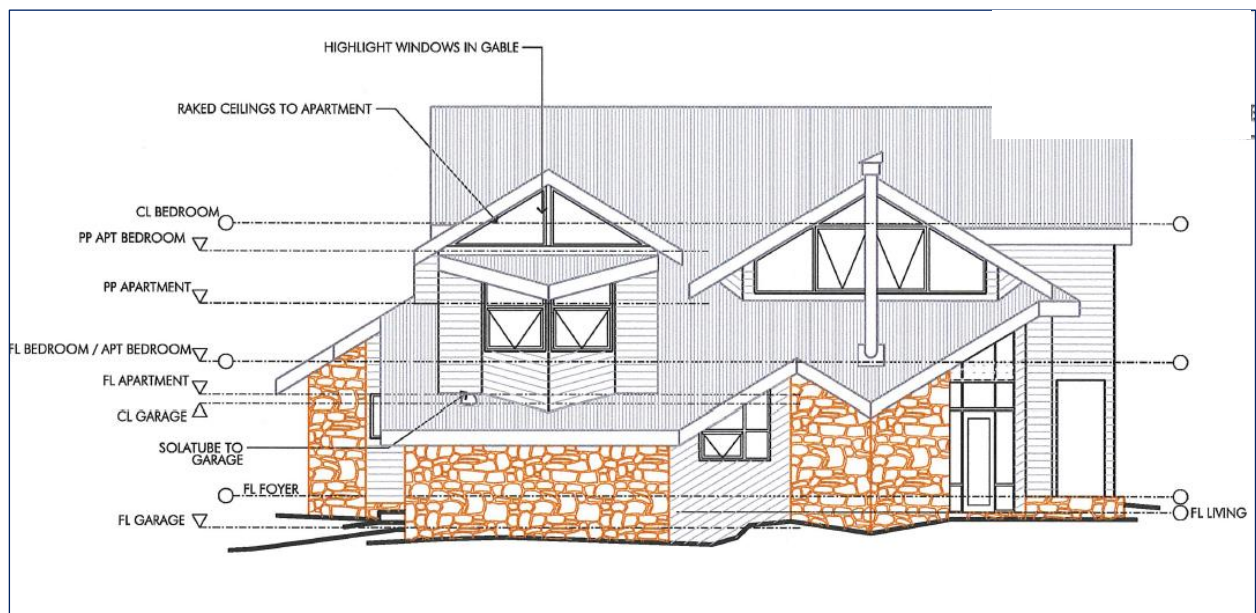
| Proposed eastern elevation (Source: Applicant's documentation)
